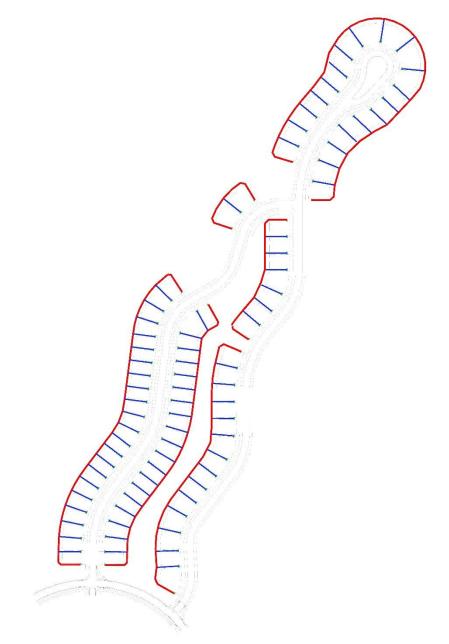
Fence Building Responsibility Plan & Details (Phase 1) – Wild Oak
